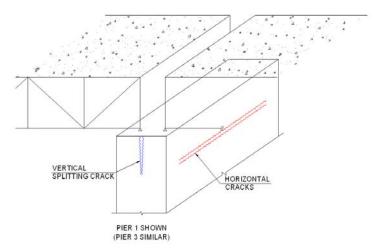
Typical Cracking Patterns Observed in Piers 1 and 3
